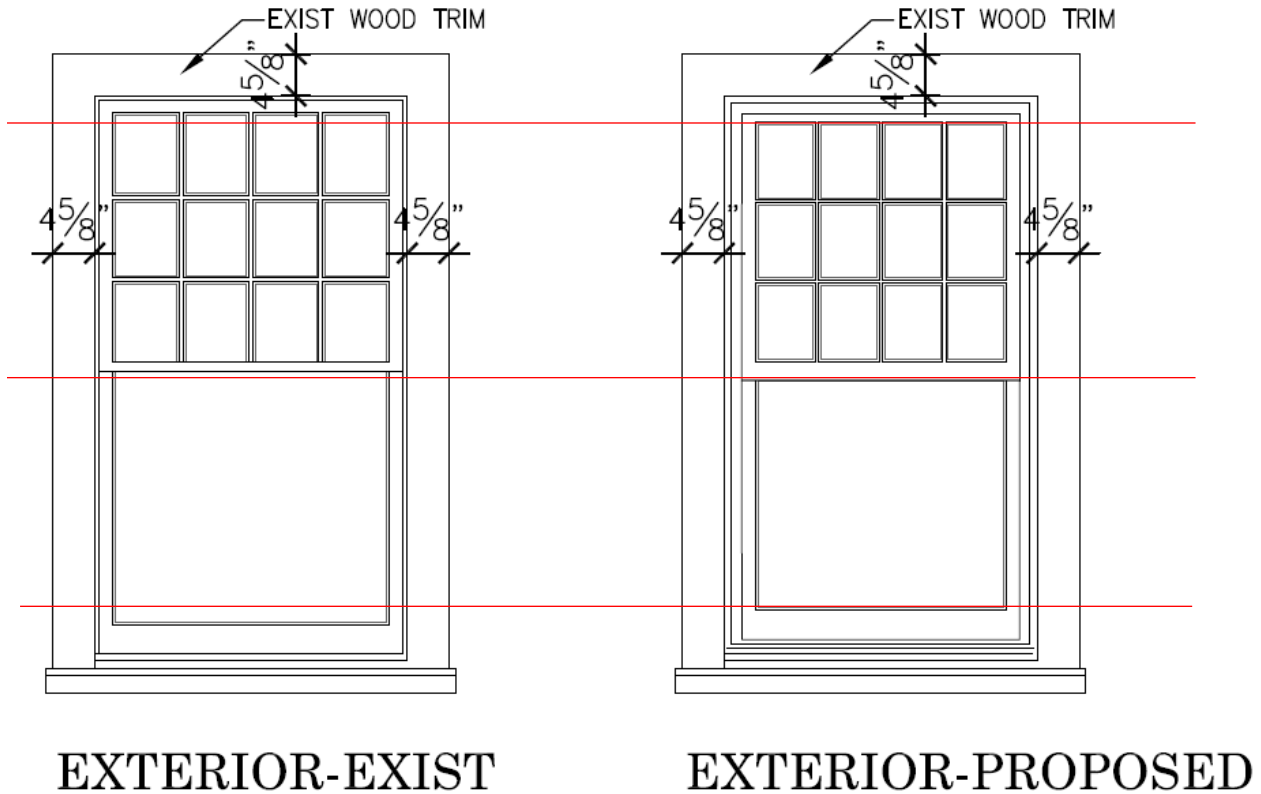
Existing and proposed window elevations (typical). The red lines show the differences in alignment of the top, meeting, and bottom rails.
